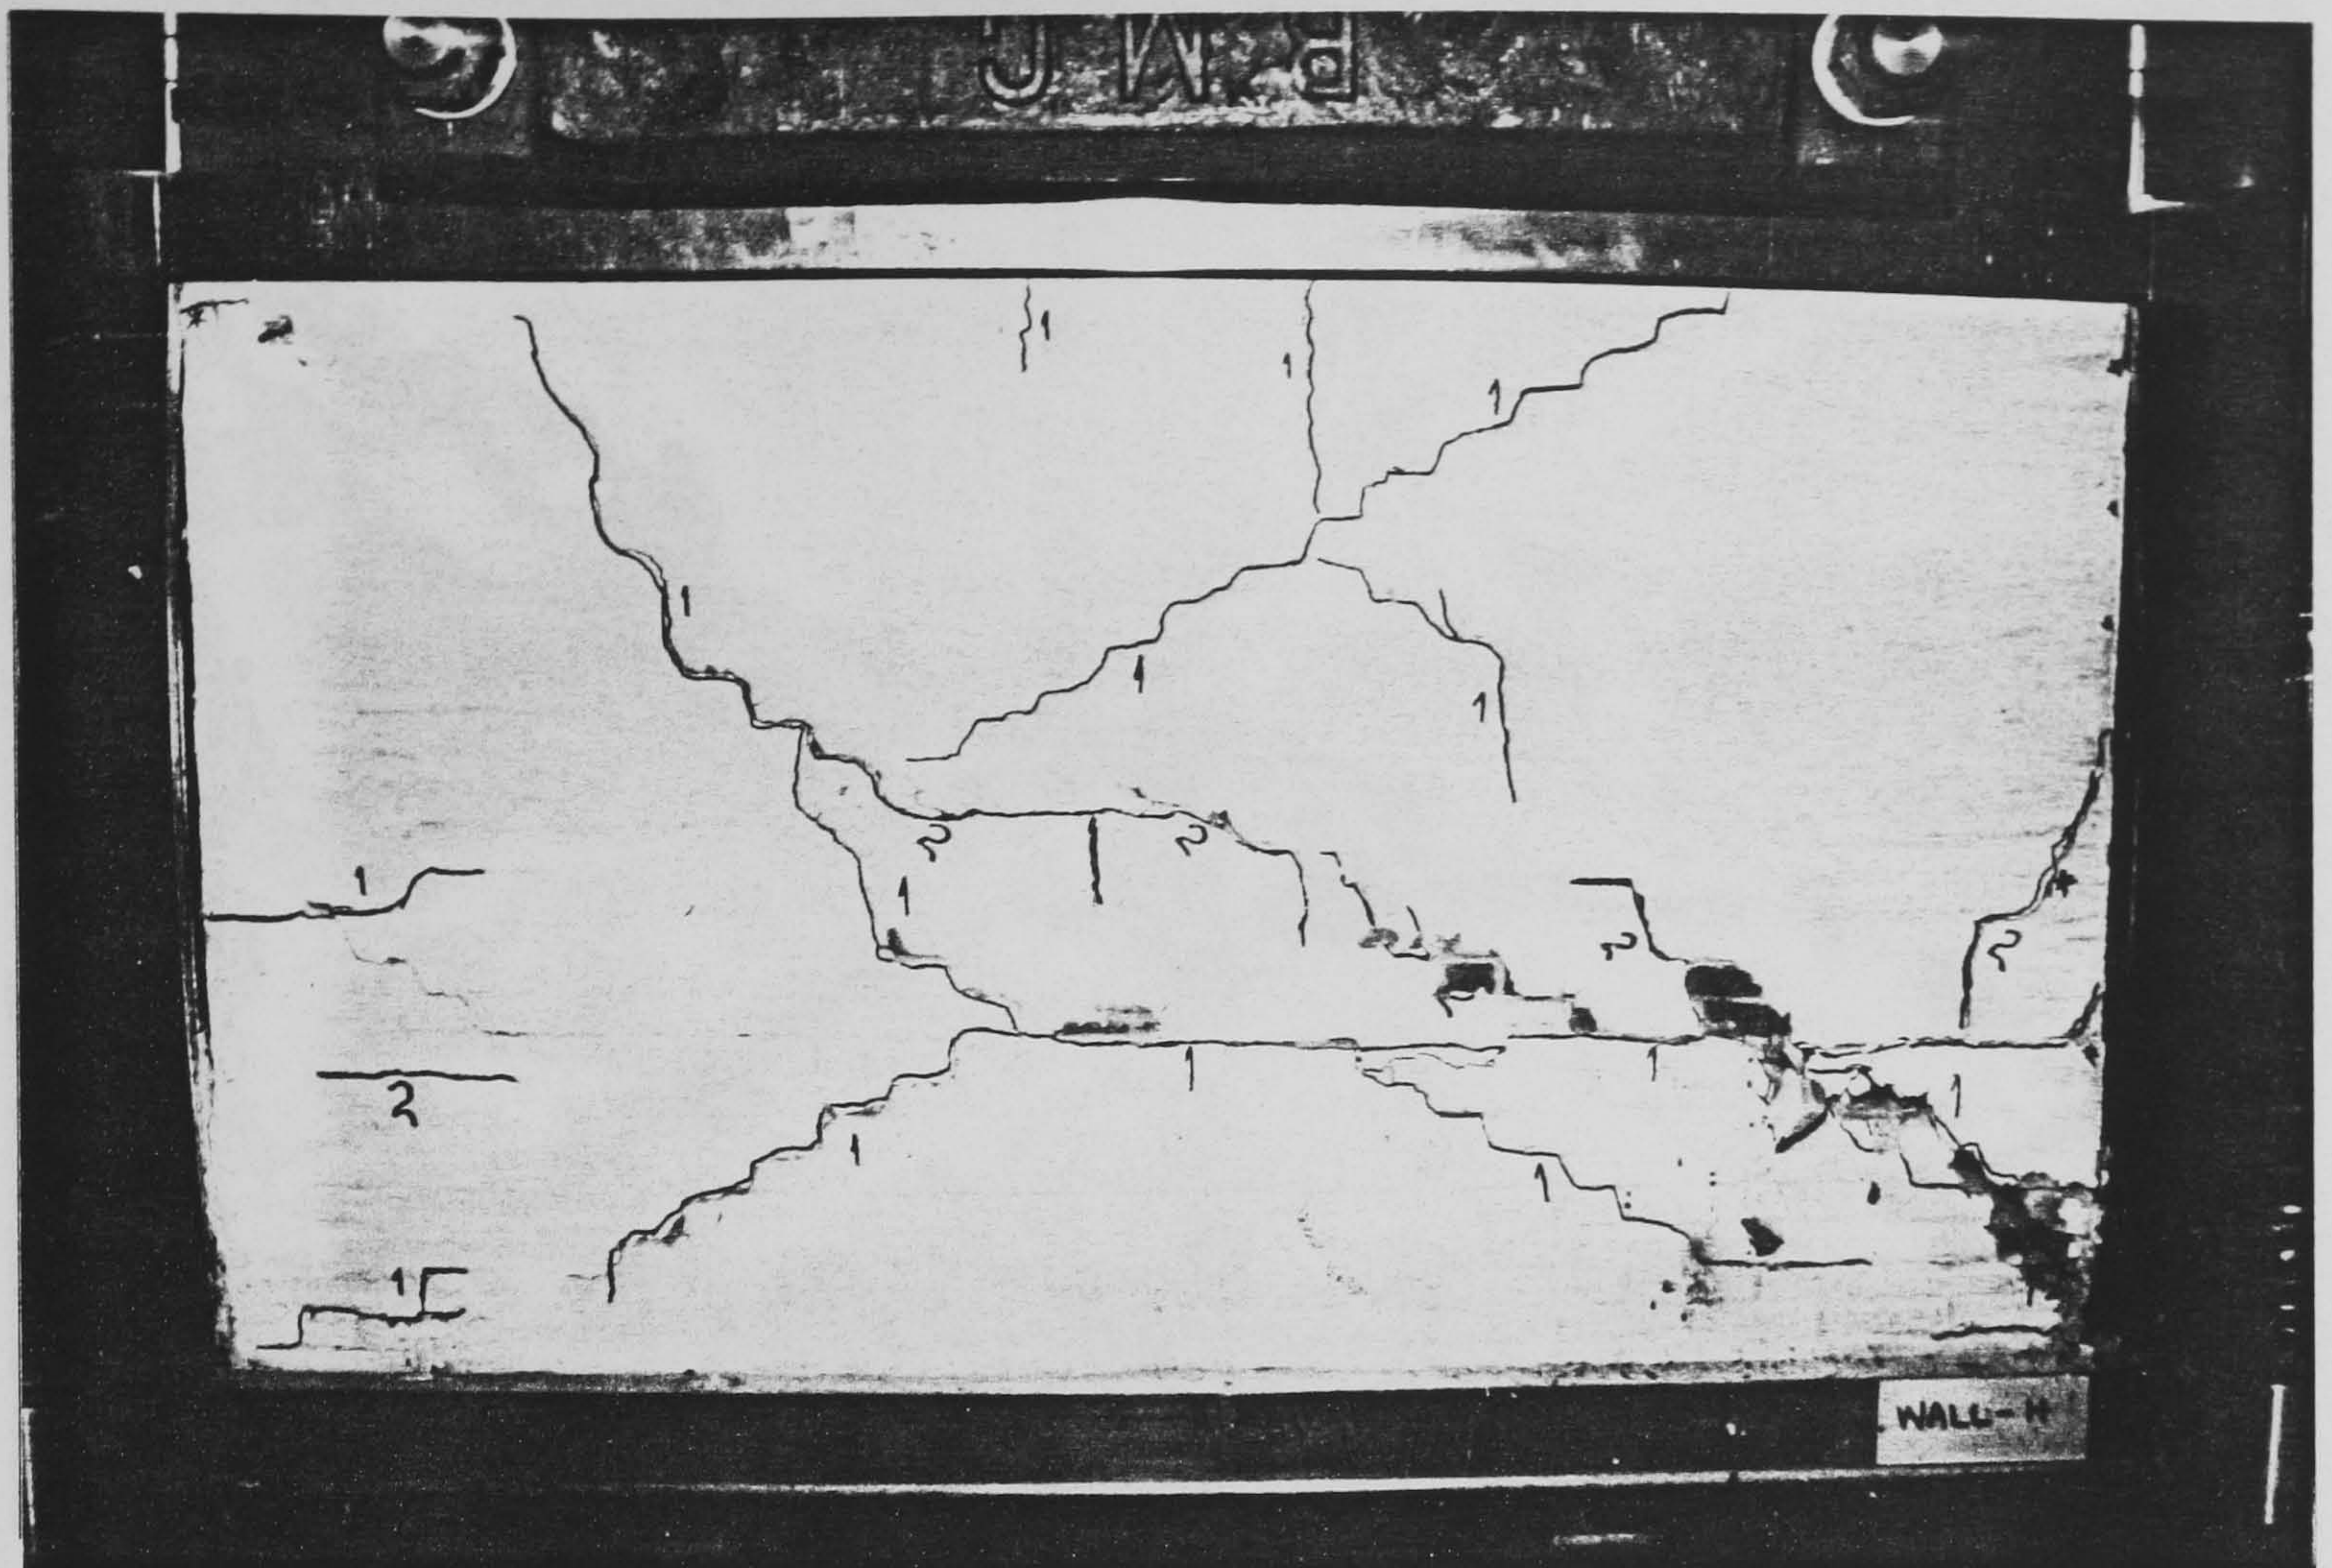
Collapse sequence-frame 2 (wall-H)
